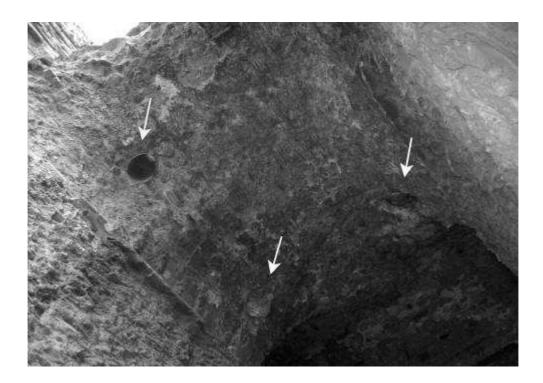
Palatine, substructures of the Severian Bath. Barrel vault built on brick linings of bipedales and bessales, with lattice ribs and reference tubes embedded in the concrete.
